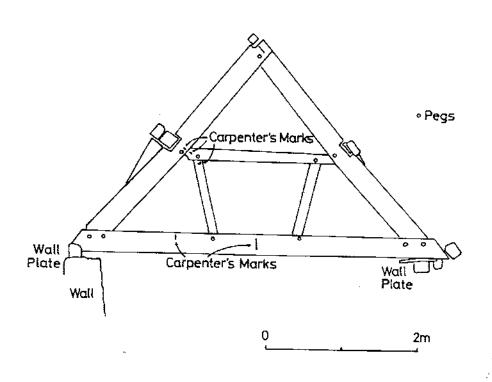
Structure 3. Roof Truss; Detail. (Sewter)
